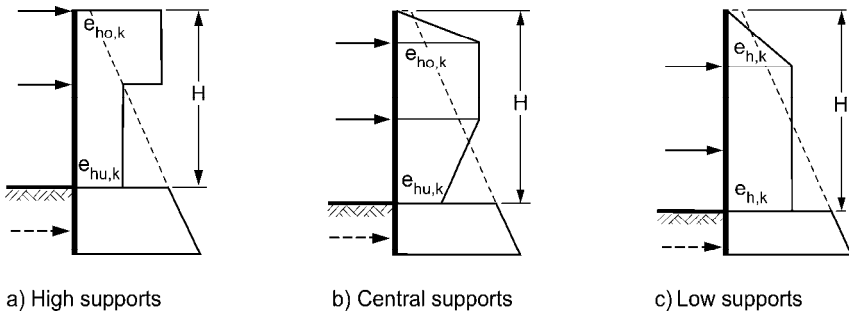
Pressure diagrams for double-propped sheet pile walls and in-situ concrete walls
